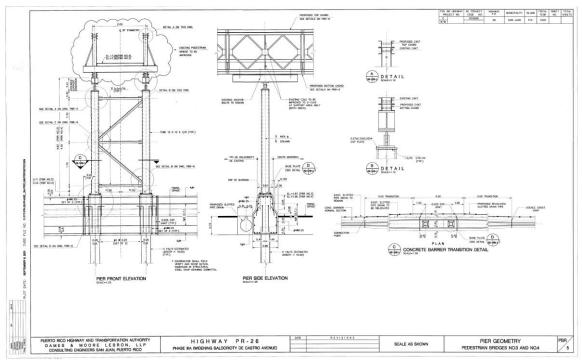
Bridge Drawings 2001 – Sheet 5
